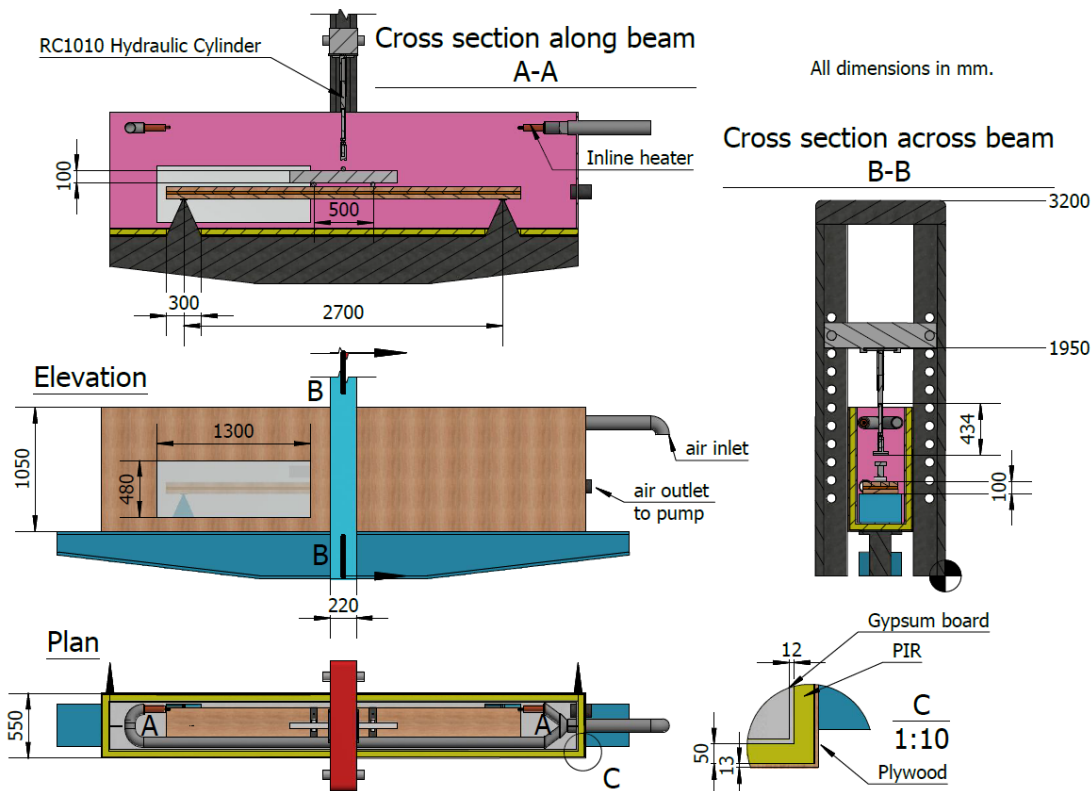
Plan, section, elevation and detailed views of the experimental set-up for heating of CLT beams under sustained loads. All dimensions in mm.
